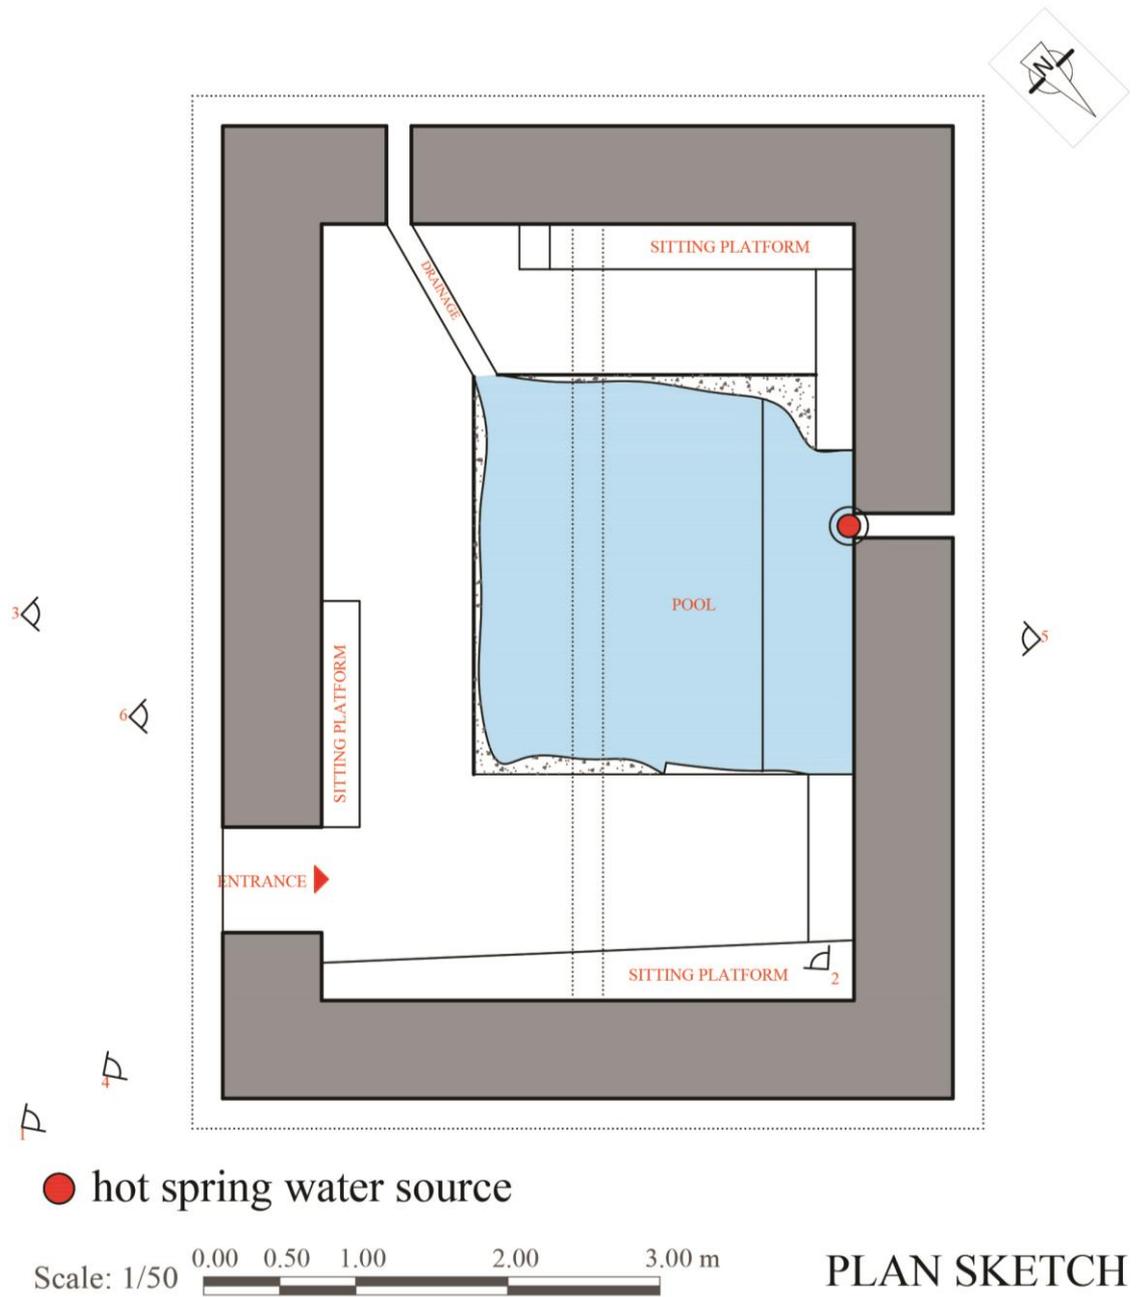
Kelalan Thermal Spring Bath A, Plan Sketch
